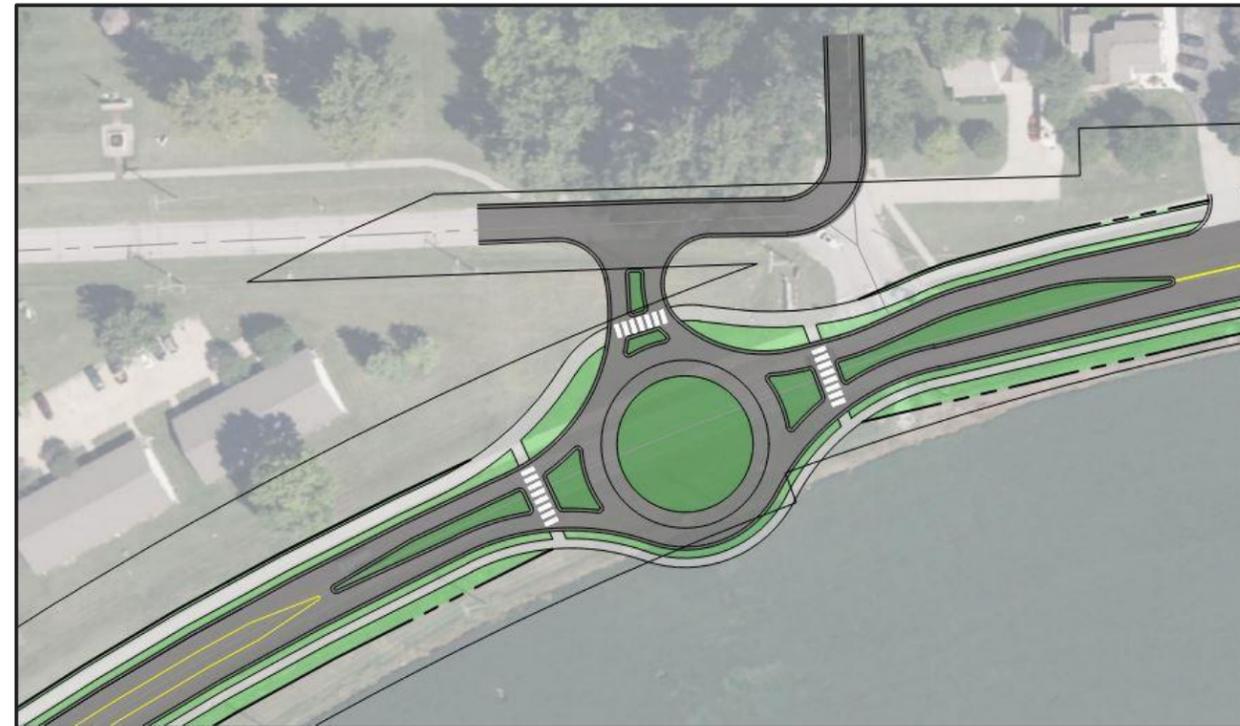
83<sup>rd</sup> Street & Lexington Avenue
